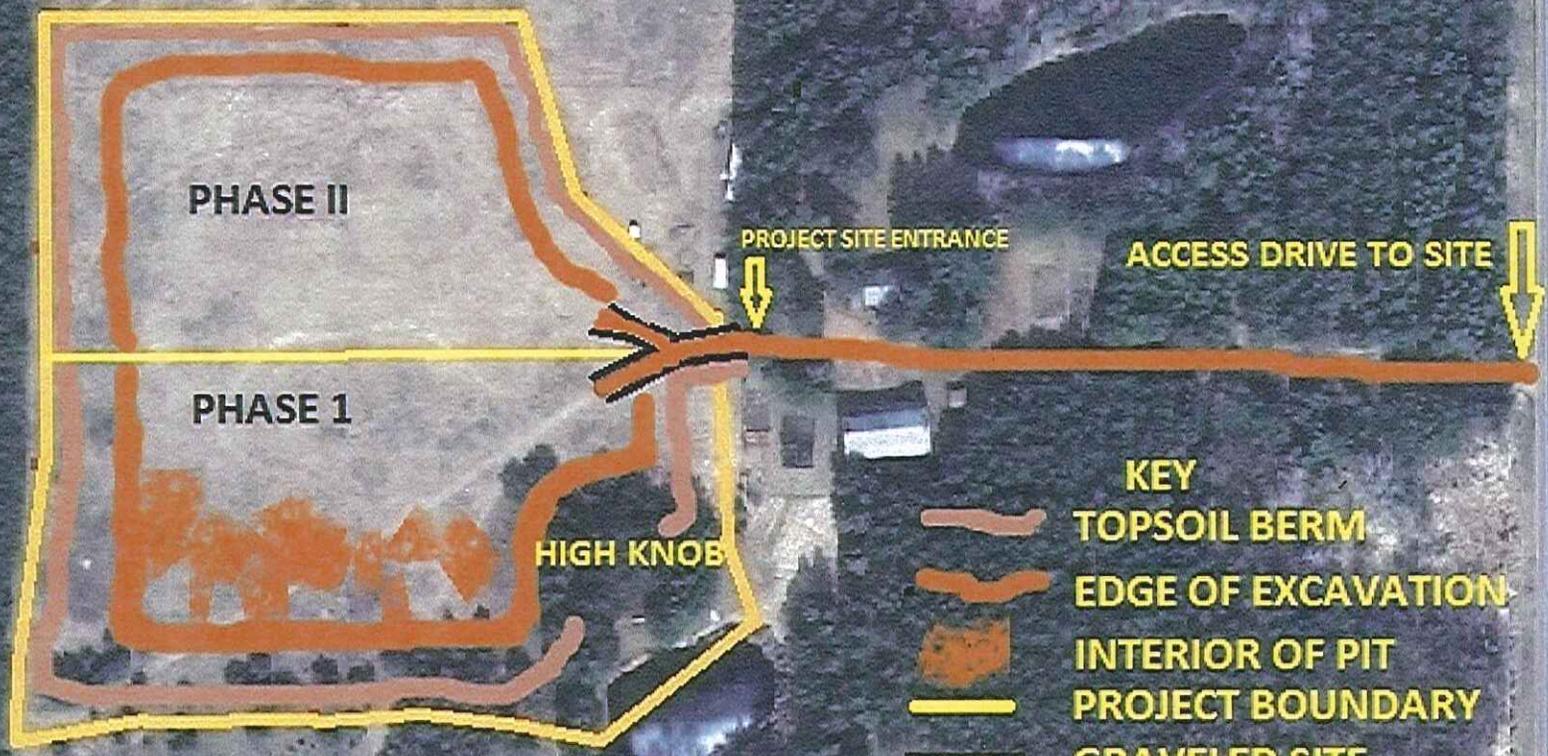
PLAN VIEW OF EXCAVATION PHASES, LOCATION OF EROSION CONTROL BERMS AND HAUL WAYS
